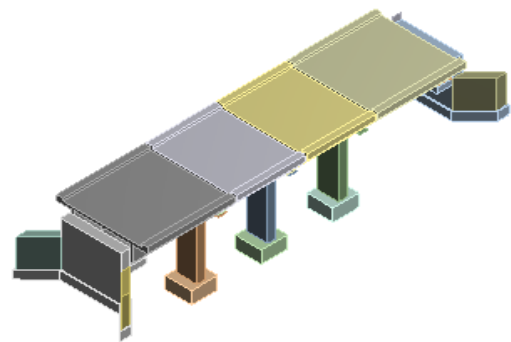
(b): Reinforced concrete girder bridge with cantilever flared wing wall
